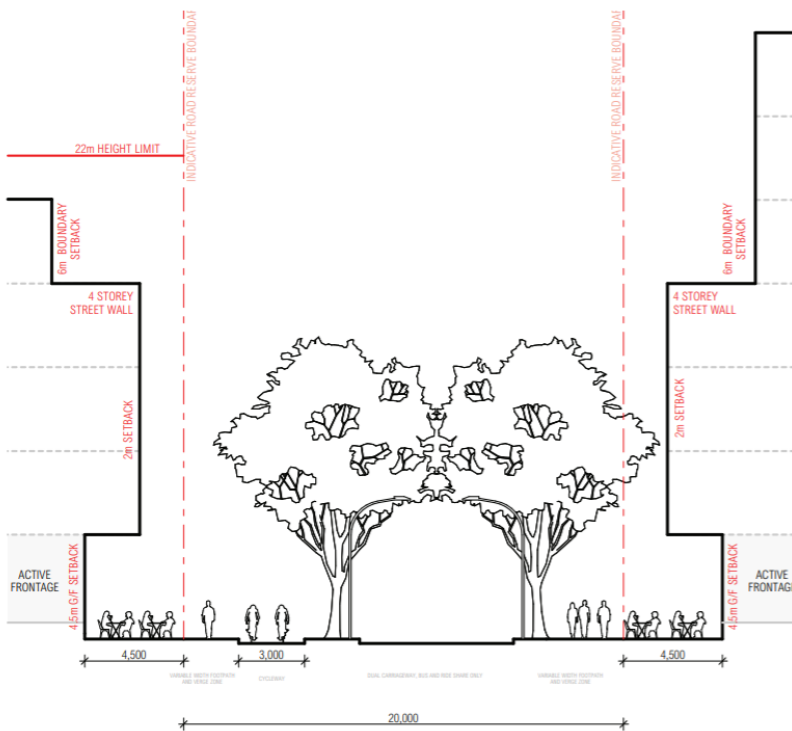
Indicative street section – O’Riordan Street (A), North Alexandria
